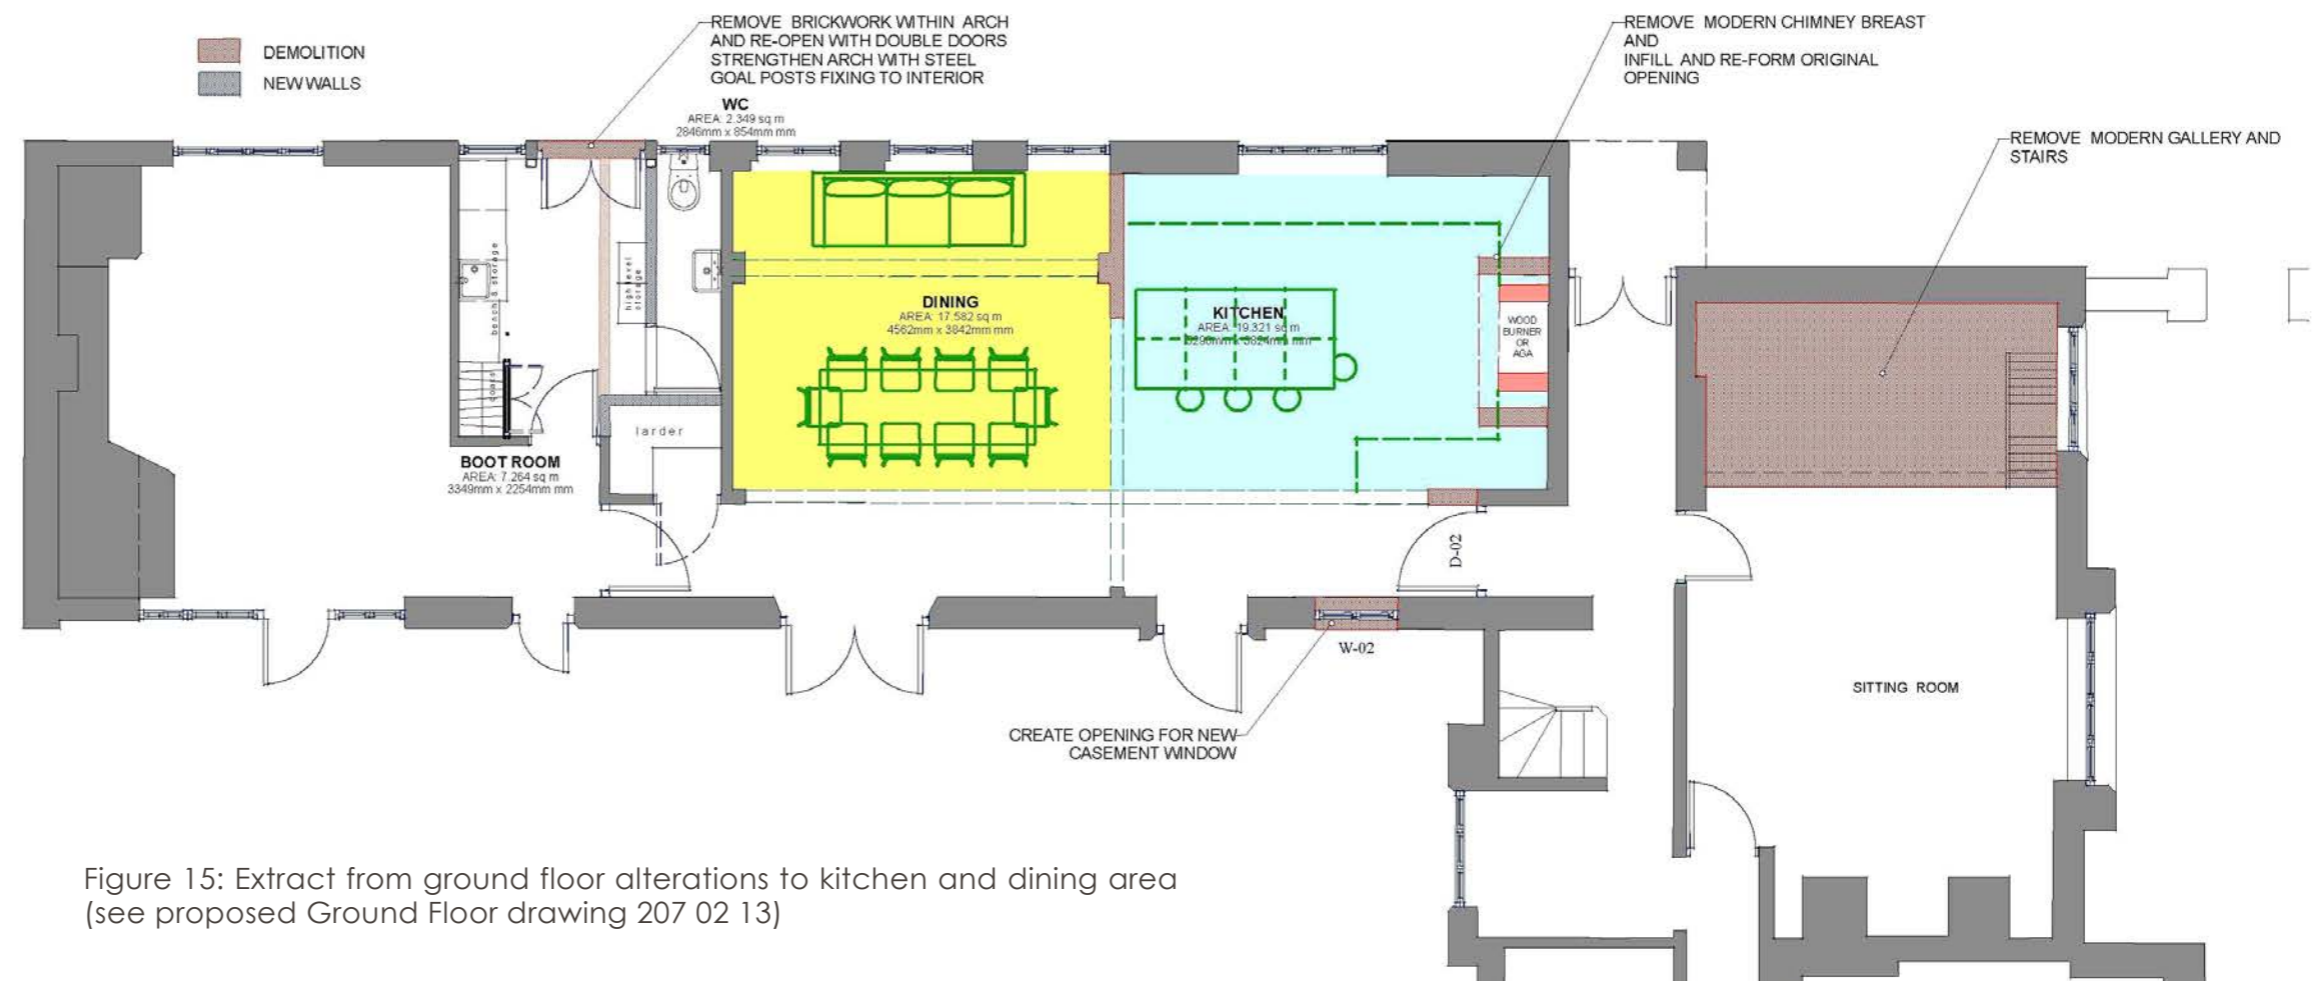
Extract from ground floor alterations to kitchen and dining area (see proposed Ground Floor drawing 207 02 13)
